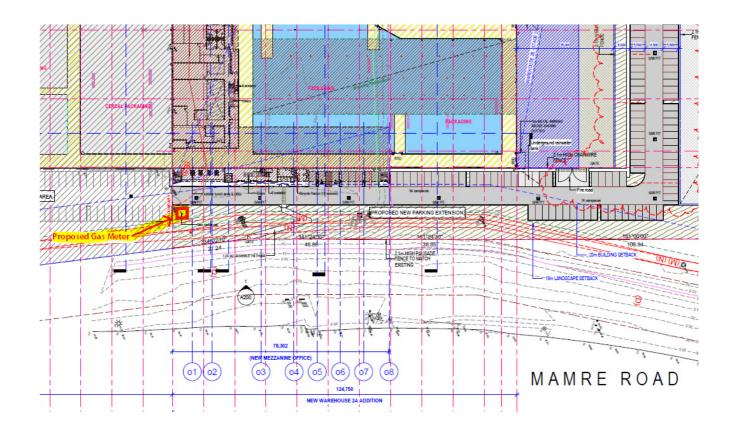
Proposed Gas Meter – Shown on Architectural Plan by HLA Architects
